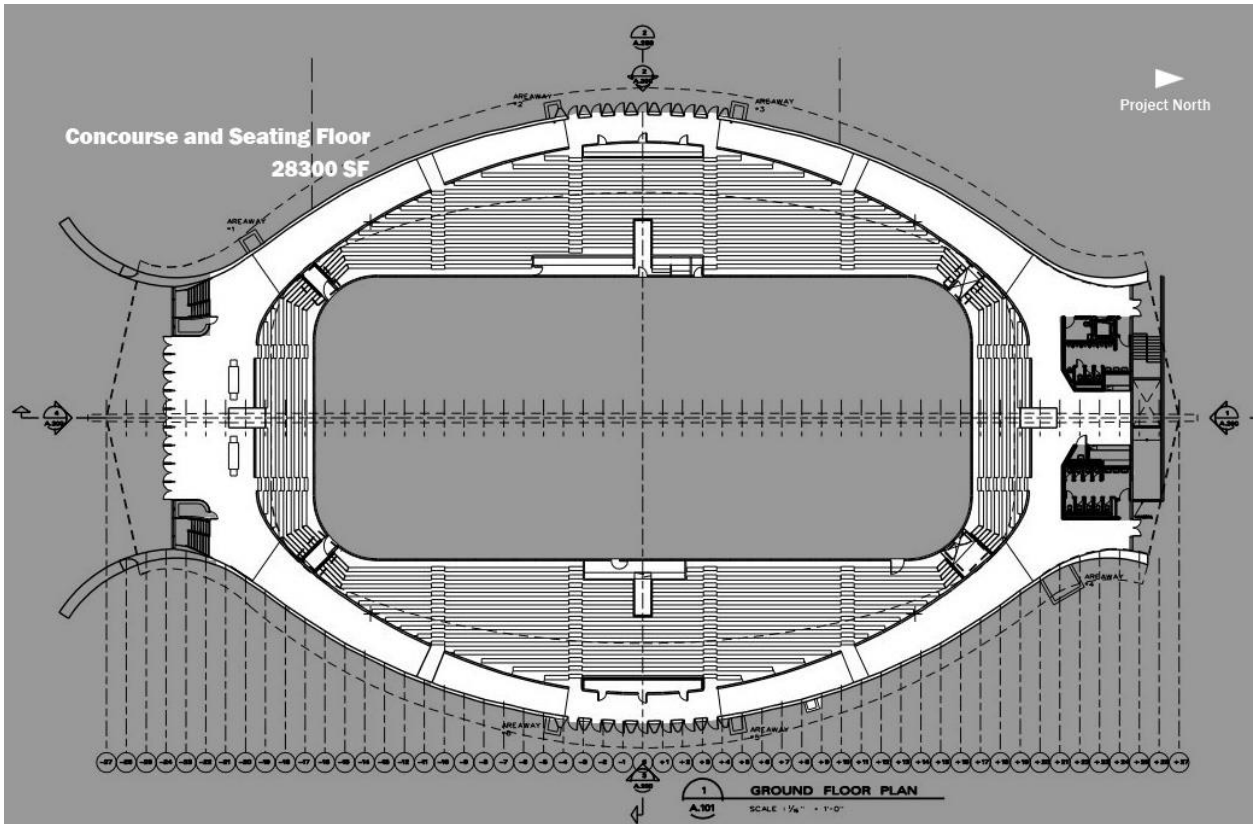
| Ground Floor Plan – Concourse and Seating Floor
